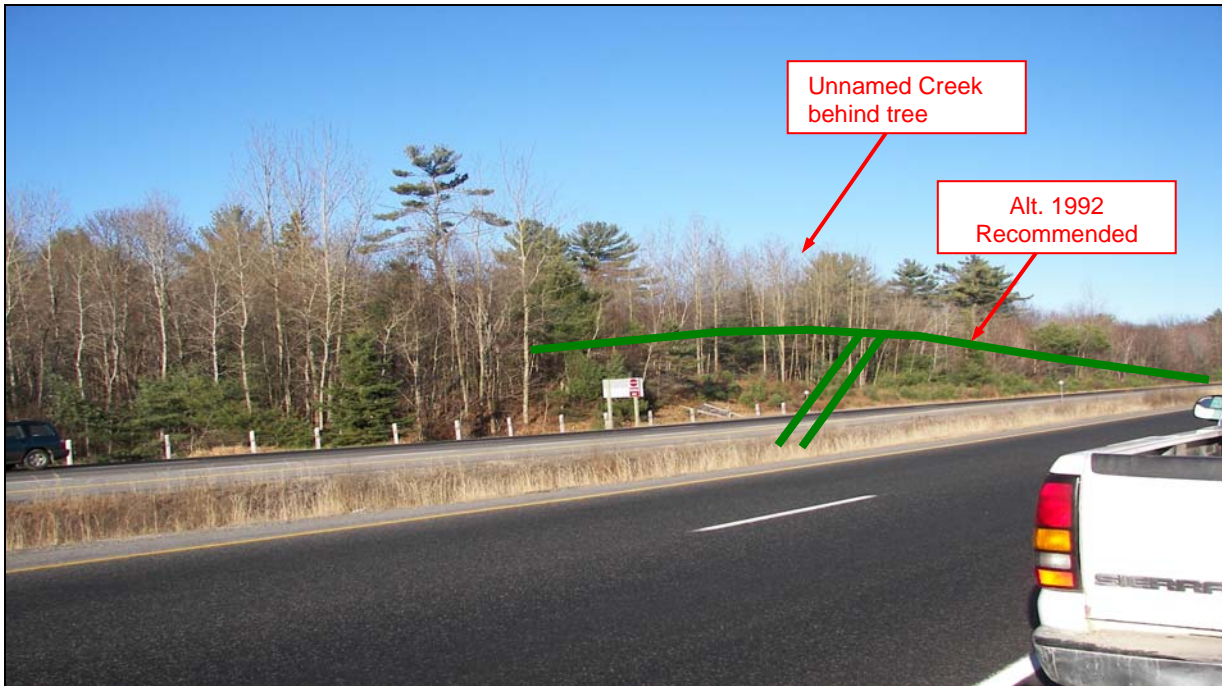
Viewing north east from about 100 south of flood plan on east side of Holiday Park Drive (November 12, 2009)
